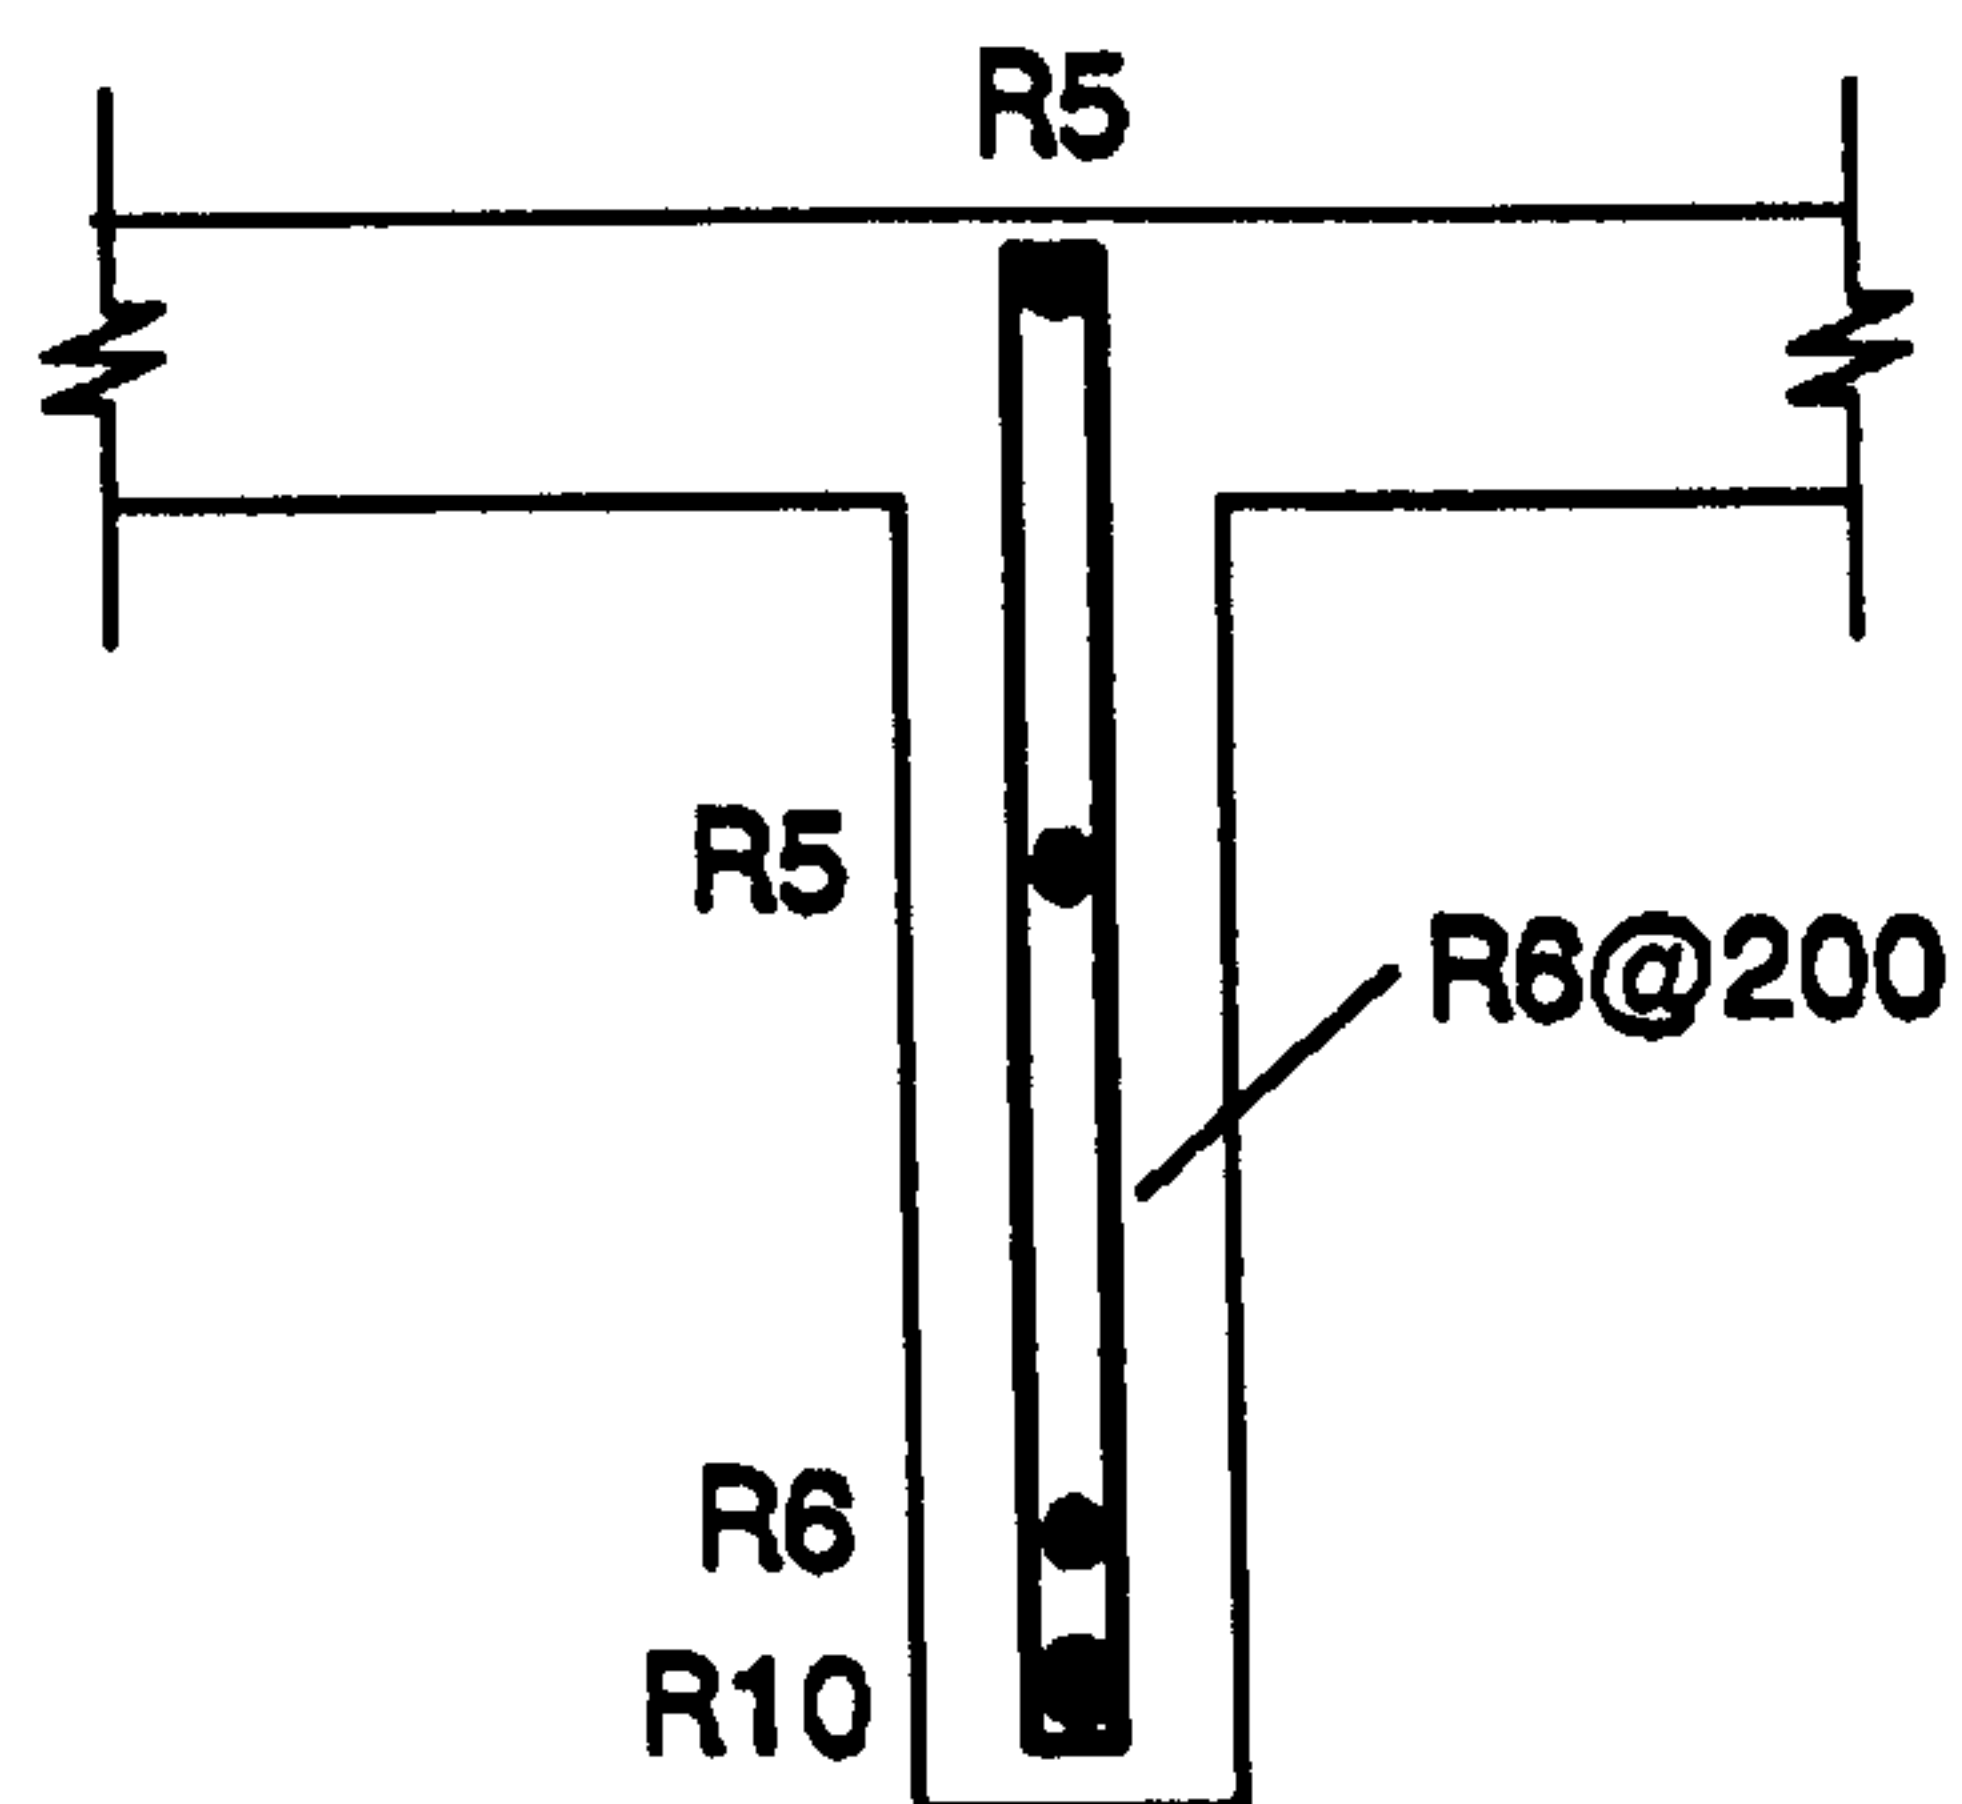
Reinforcement Details of Diaphragm in the Model Bridge Deck
